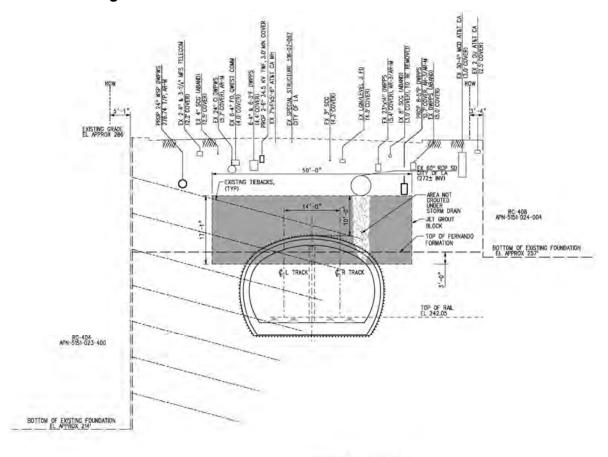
Jet Grout Zone above SEM Tunnel on Flower Street
